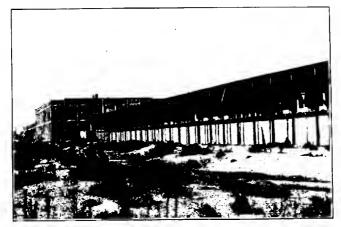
GENERAL VIEW OF ICE-STORAGE BUILDING AND PRECOOLING SHED.
